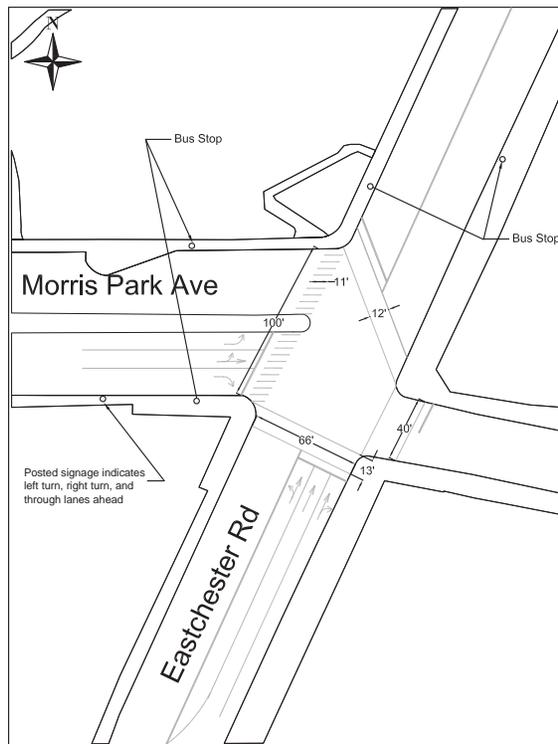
Intersection of Morris Park Avenue and Eastchester Road
